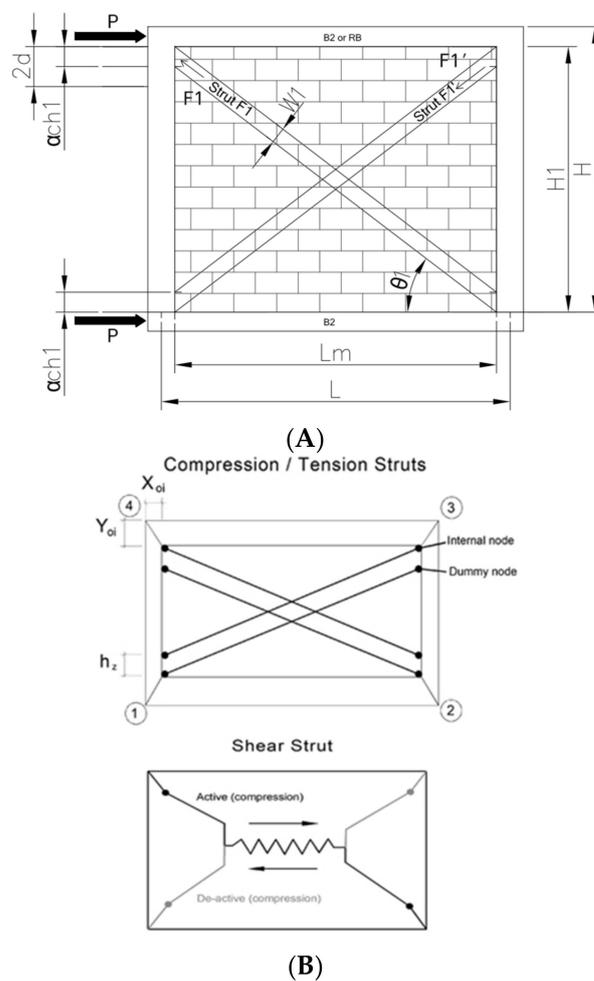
Model of masonry wall building reinforced with x-bracing frame. (A) Model of masonry wall building reinforced with x-bracing concrete frames for compressive strength. (B) Model of masonry wall building reinforced with x-bracing concrete frame for compression/tension and shear strut.
